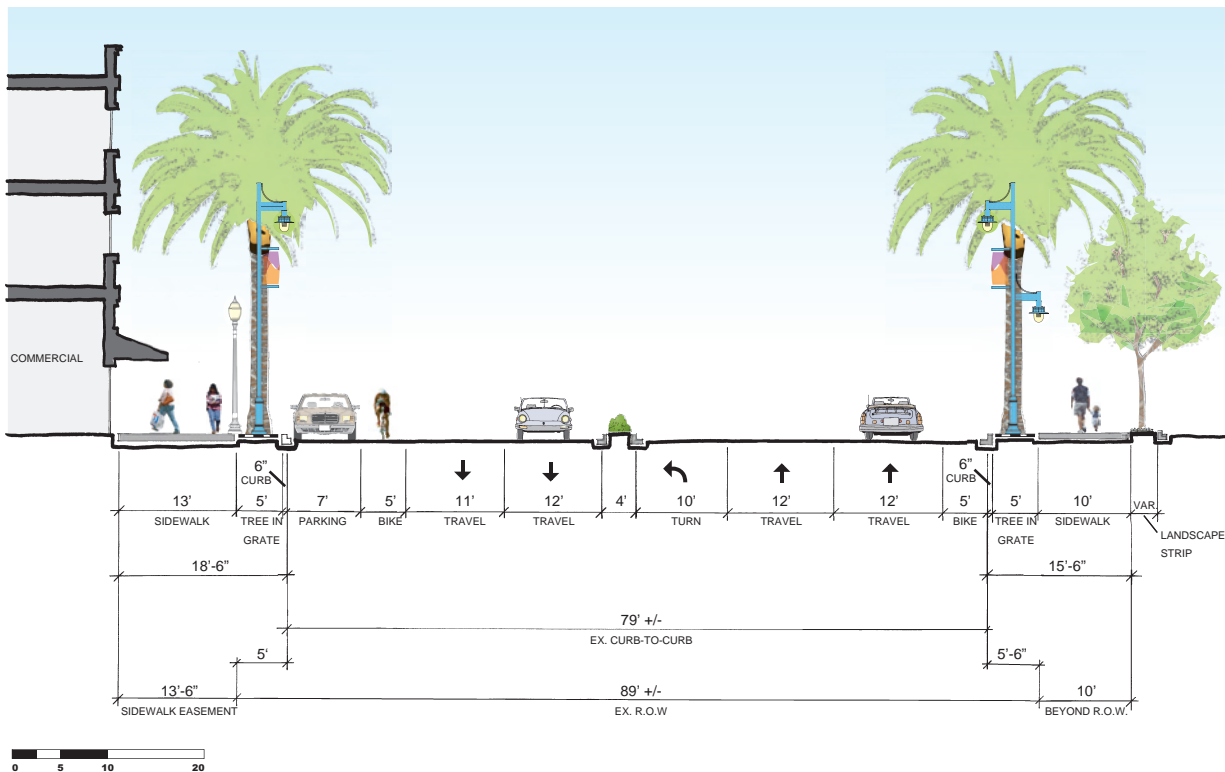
C.56: Section of Mare Island Way South of Entry to Ferry Parking ⑦
